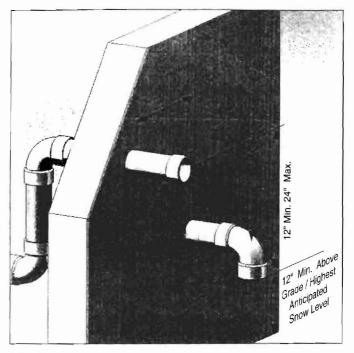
Direct Vent - Alternate Sidewall Termination of Vent and Combustion Air Piping
